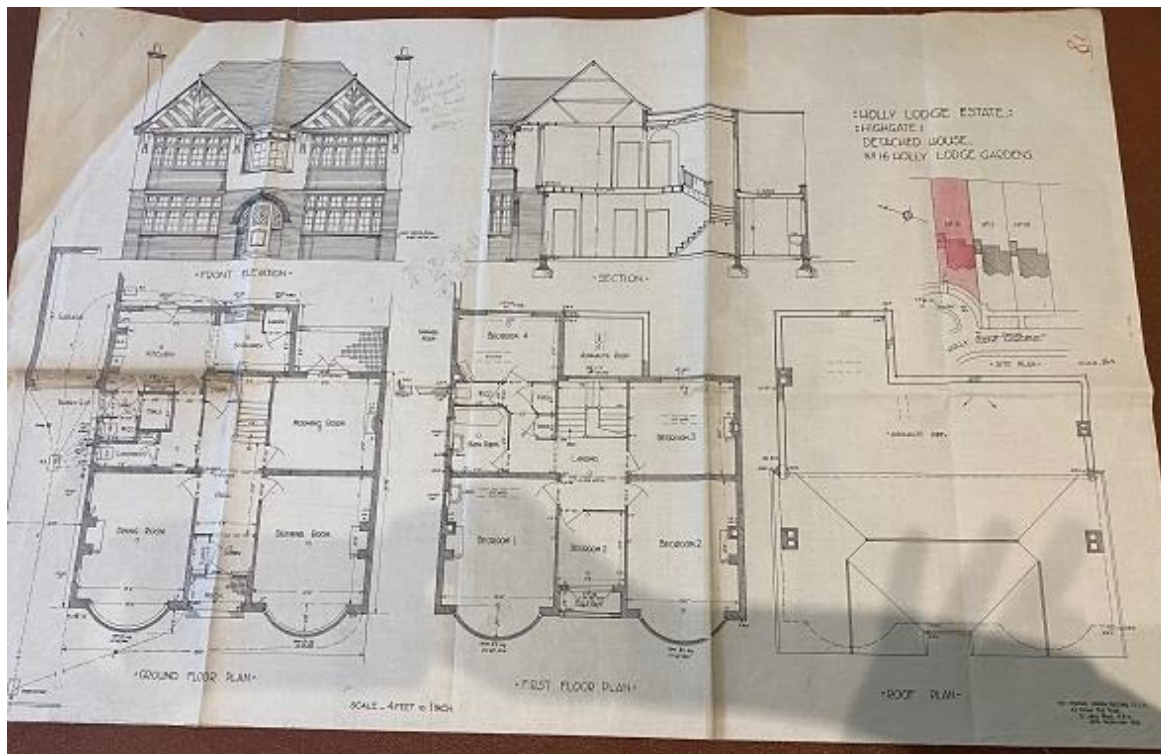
Photograph of original drawing of 16 Holly Lodge Gardens dated 30 September 1925 – see below. The roof plan shows a large area of flat roof to the rear of the hipped roof at the front. This approach was adopted in the original design of the neighbouring houses and the mansion blocks next to Swains Lane.
